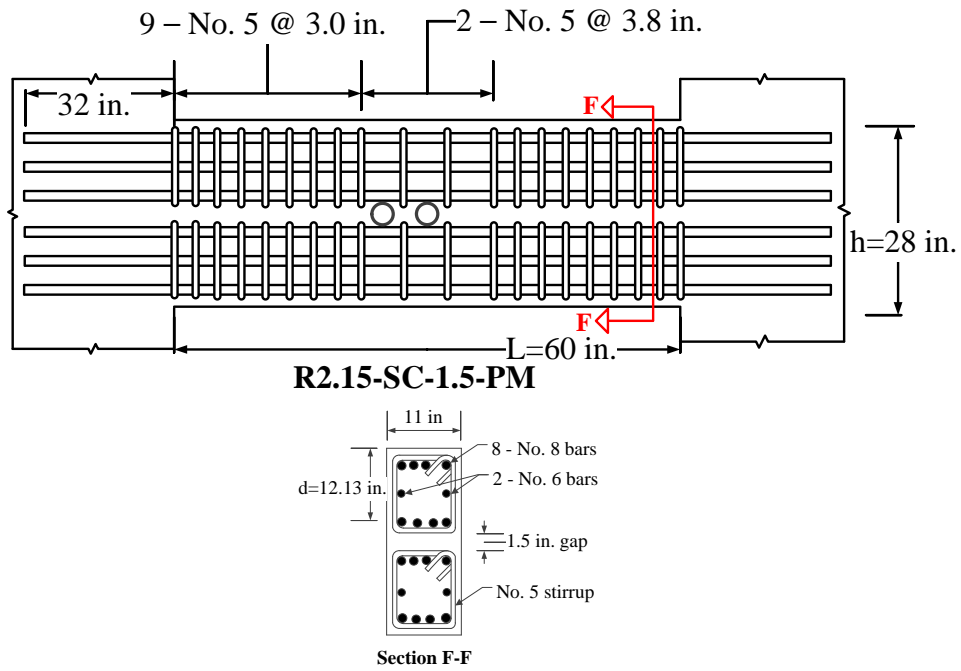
Reinforcement details of R2.15-SC-1.5-PM
